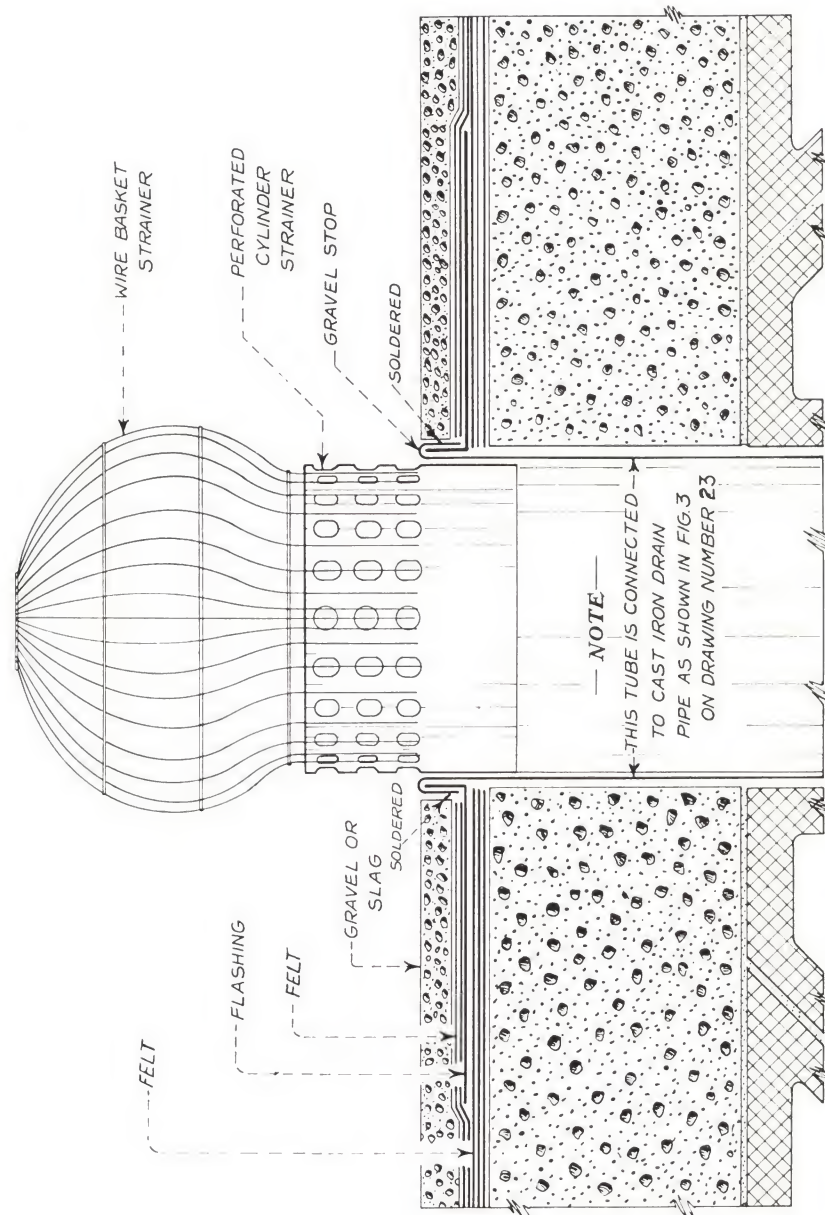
METHOD OF CONSTRUCTING GRAVEL STOP AROUND EXTREME EDGE OF OUTLET TUBE
